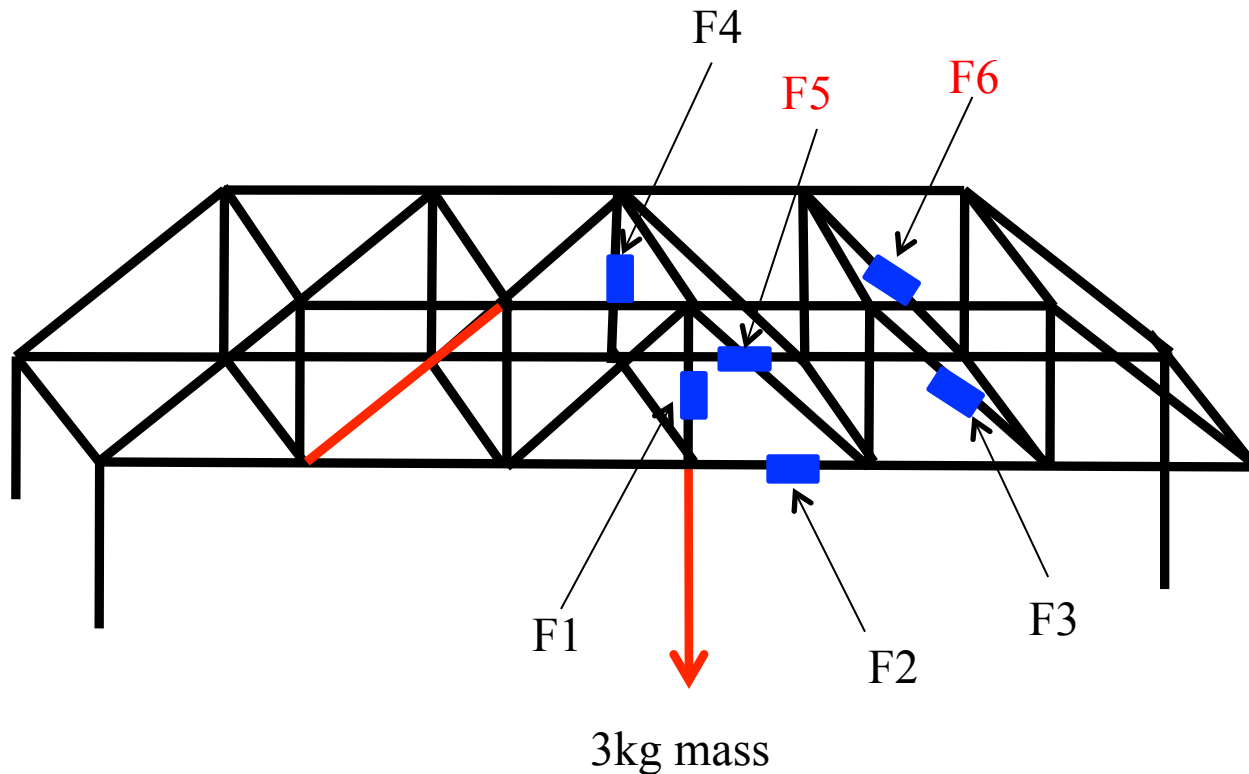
Physical Experiment: Loaded damaged truss bridge-Force sensor 6 (F6)
